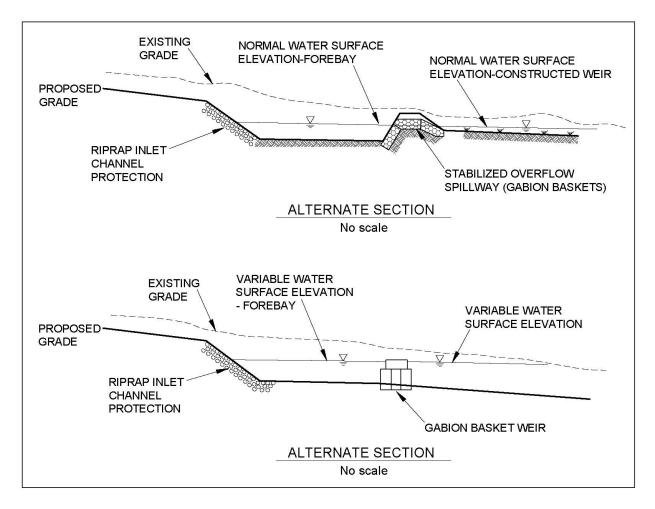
Typical Sediment Forebay Alternate Sections.
